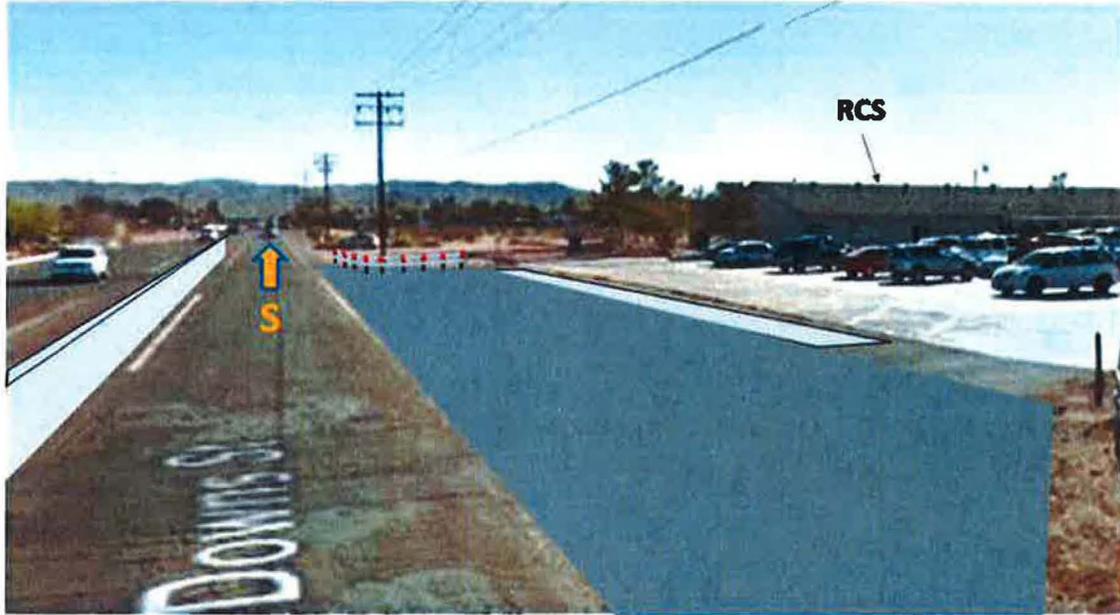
Street View – Base Paving, Curb, Gutter, and Sidewalk at RCS
